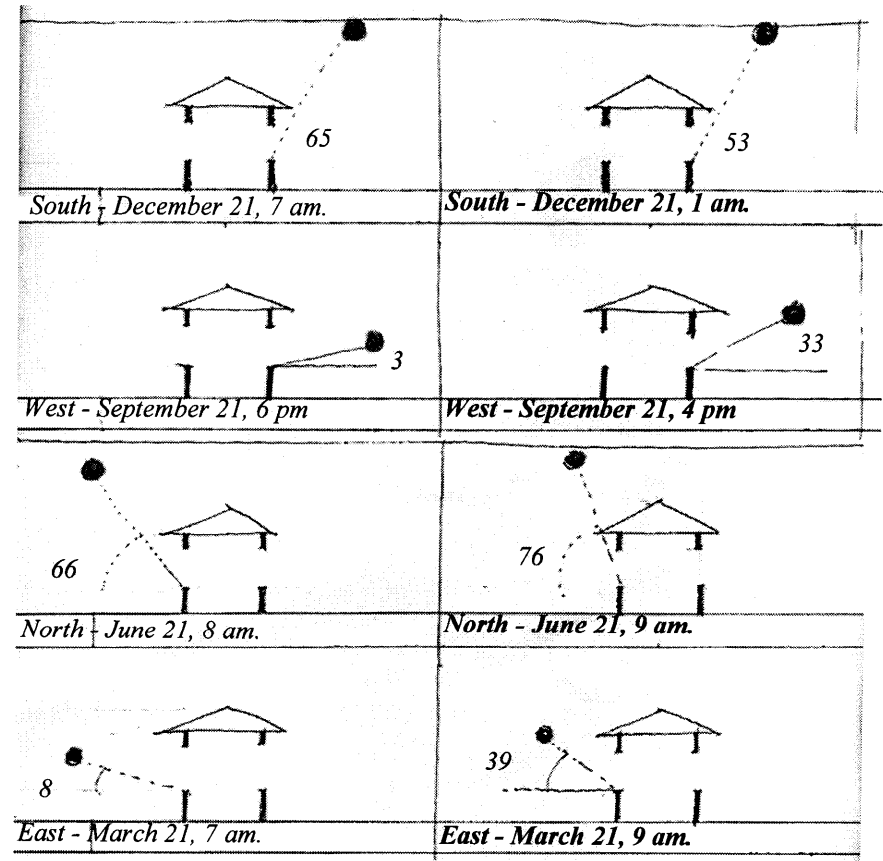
Critical profile angles for windows on each facade of house in Bangkok.
